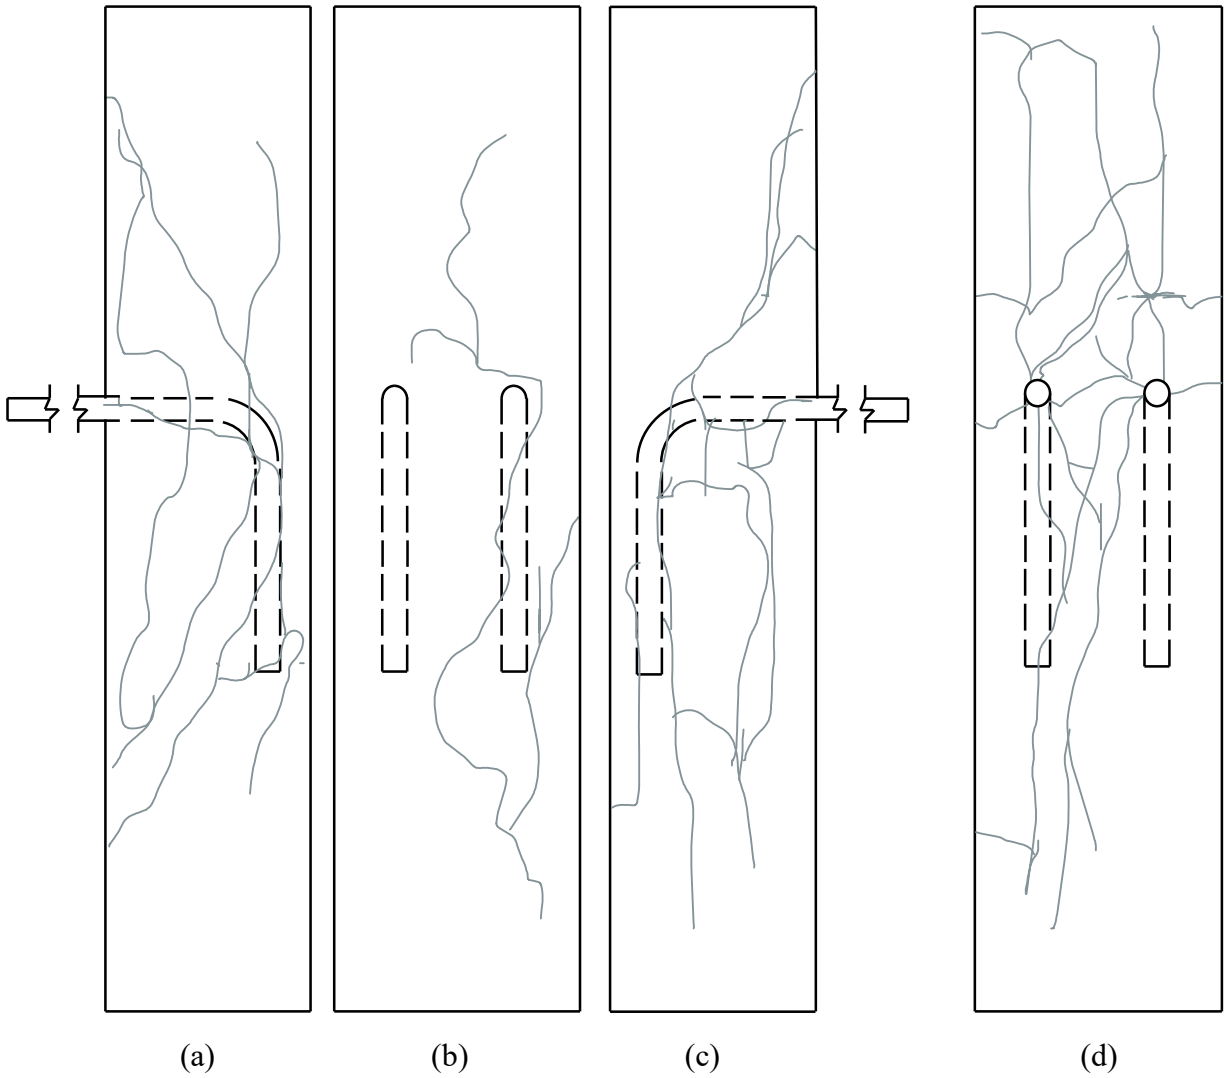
Crack pattern at maximum normalized tensile load for beam-column joint specimen P3-90: (a) west side face, (b) back face, (c) east side face, and (d) front face
